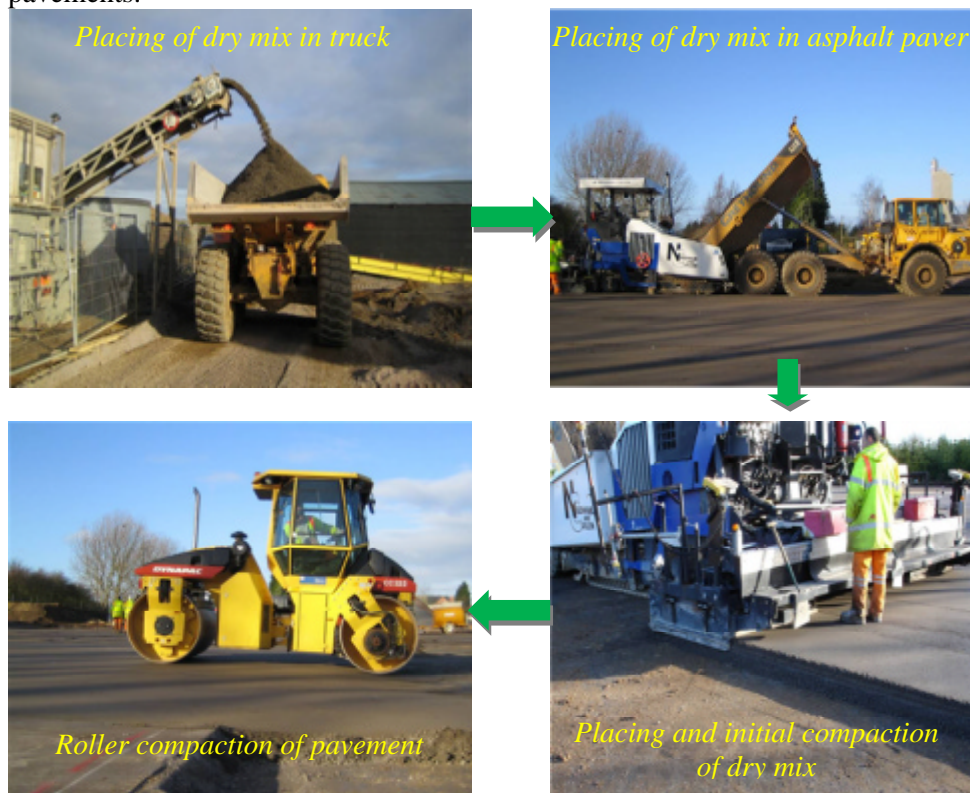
Construction of roller-compacted concrete (RCC) pavements
